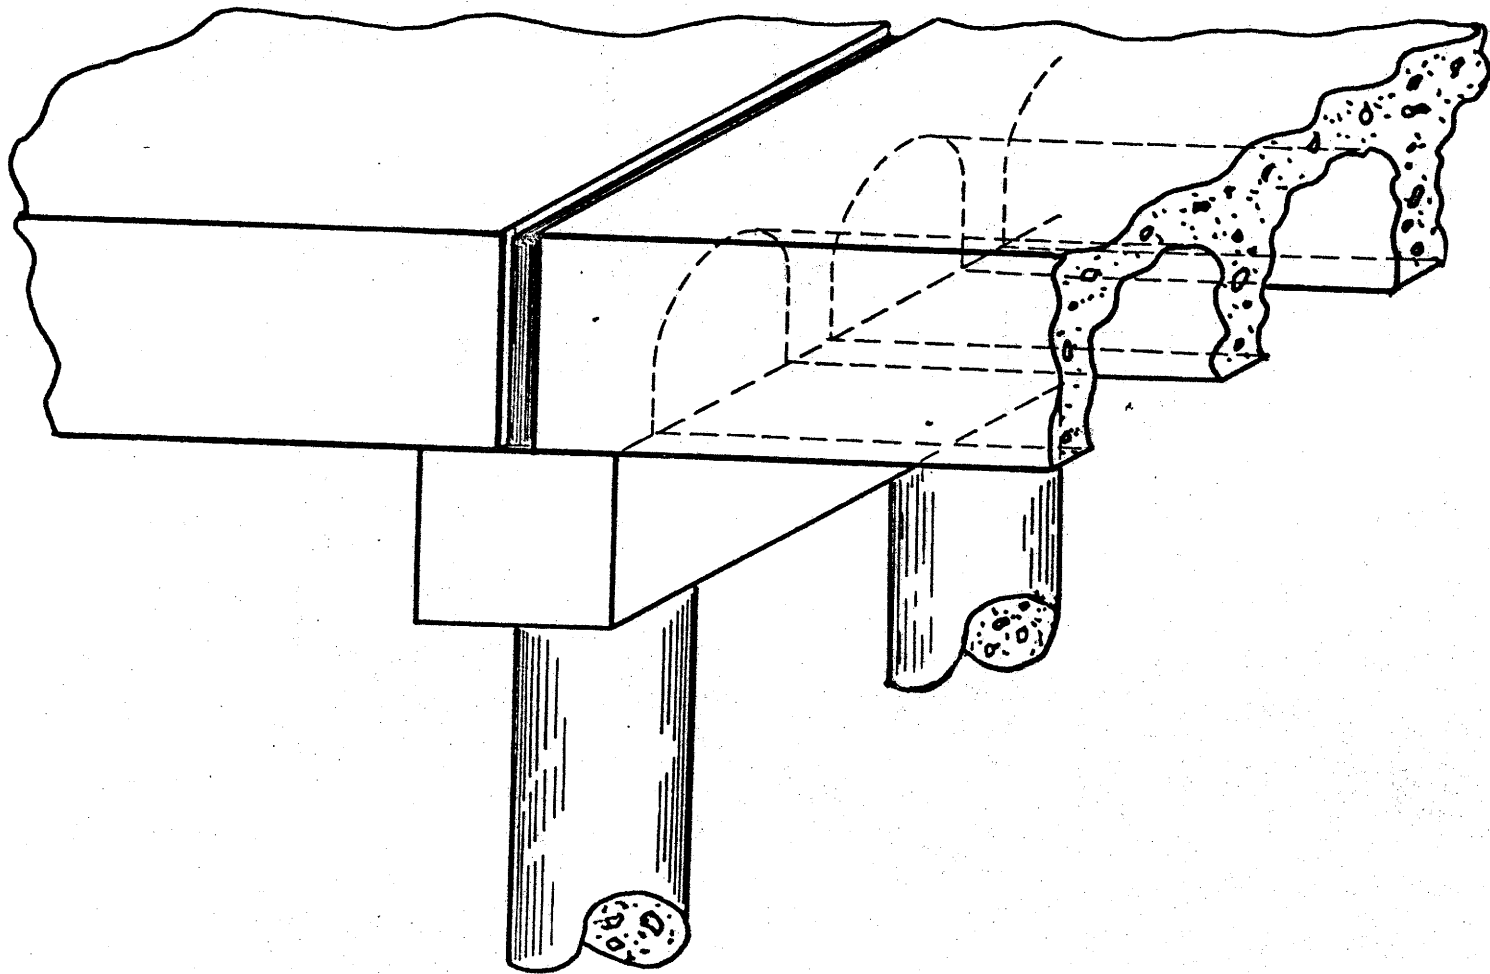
Expansion joints in pan-formed bridges are generally 3/4 inch wide and contain a fiberboard filler. Typically, only one of the adjacent spans is doweled to the pier cap.
